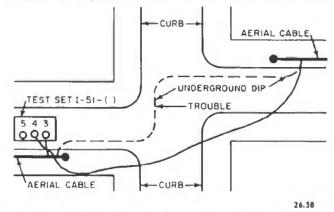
Tracing buried cable conductor with test set I-51, underground dip.
